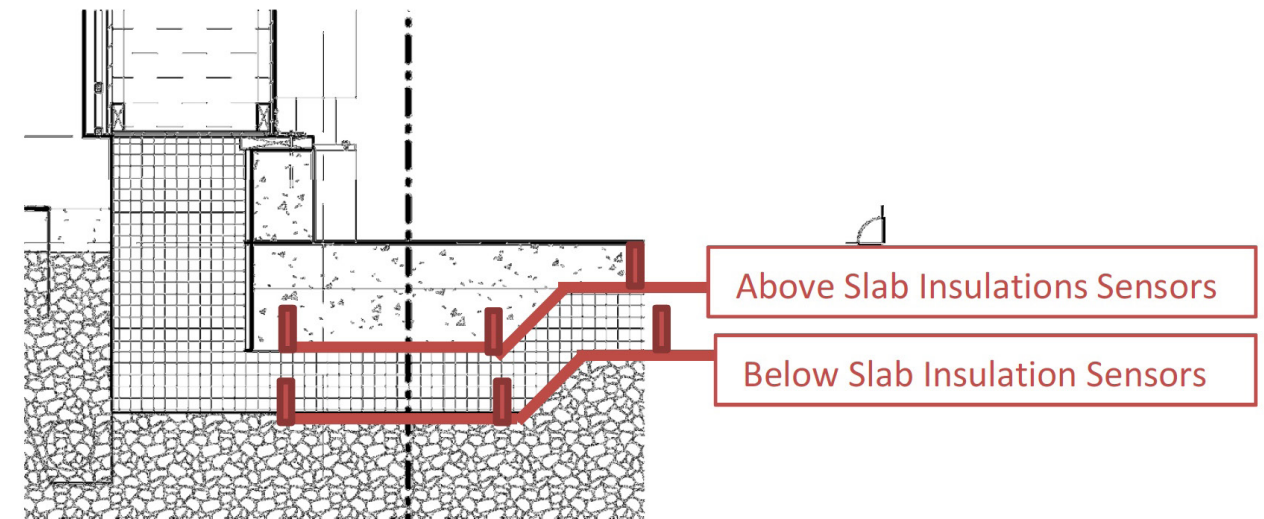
WIRL floor sensor configuration. Sensors are located in a stacked format in two separate parallel lines located in the southwest corner of the building floor.
